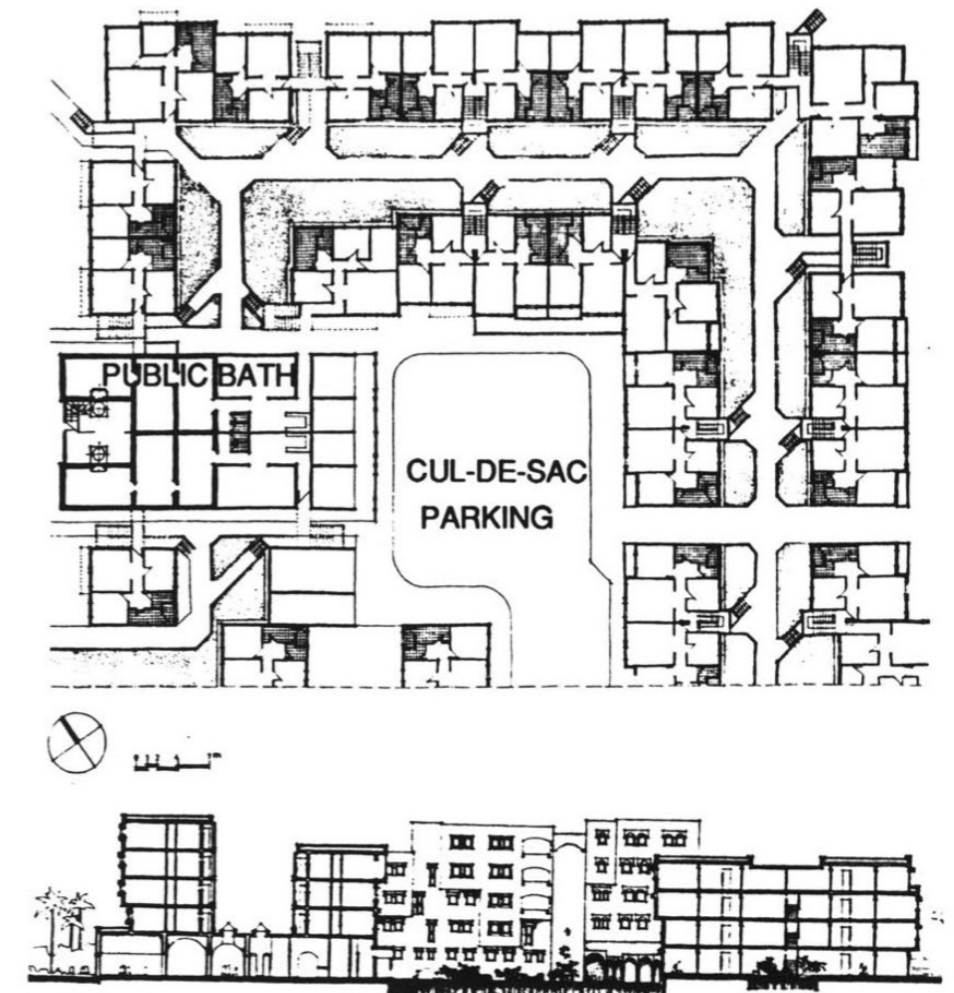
, Close-up of central area, plan and section of a typical cul-de-sac in Dar Lamane Housing Project in Casablanca, Morocco (Maganga, 2025)
